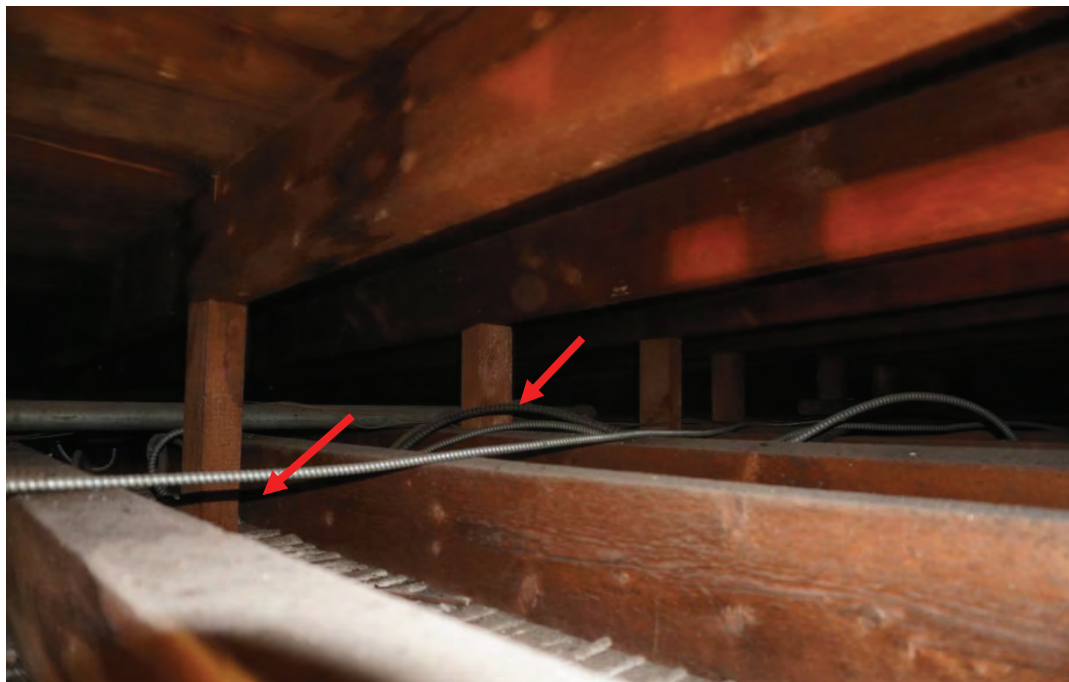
View facing northeast in roof void between 2nd floor ceiling joists and roof joists in the addition. Roof joists do not align with ceiling joists and are being supported at midspan with blocking that is resting right onto plaster ceiling (Probe #9).
